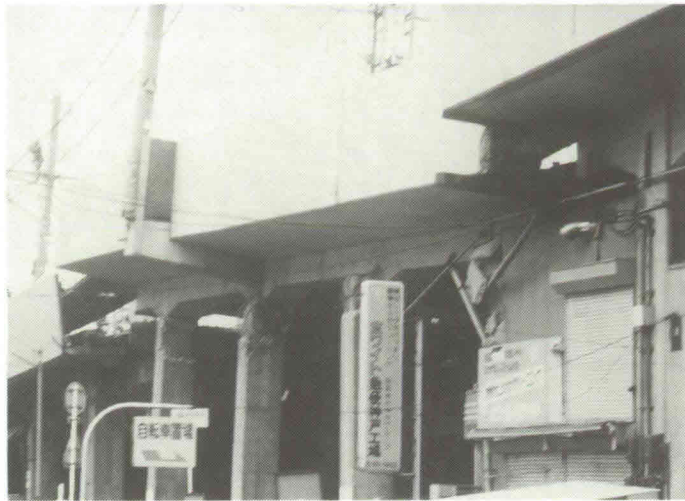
Failure of rigid-frame viaduct and twisted rails (near Rokkomichi Station, Tokaido Main Line)
